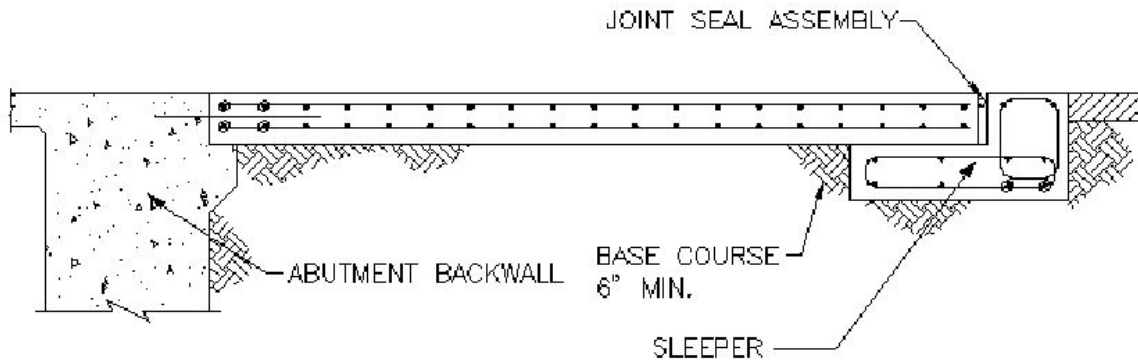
Connection of approach slab to bridge deck (standard Nevada detail)
